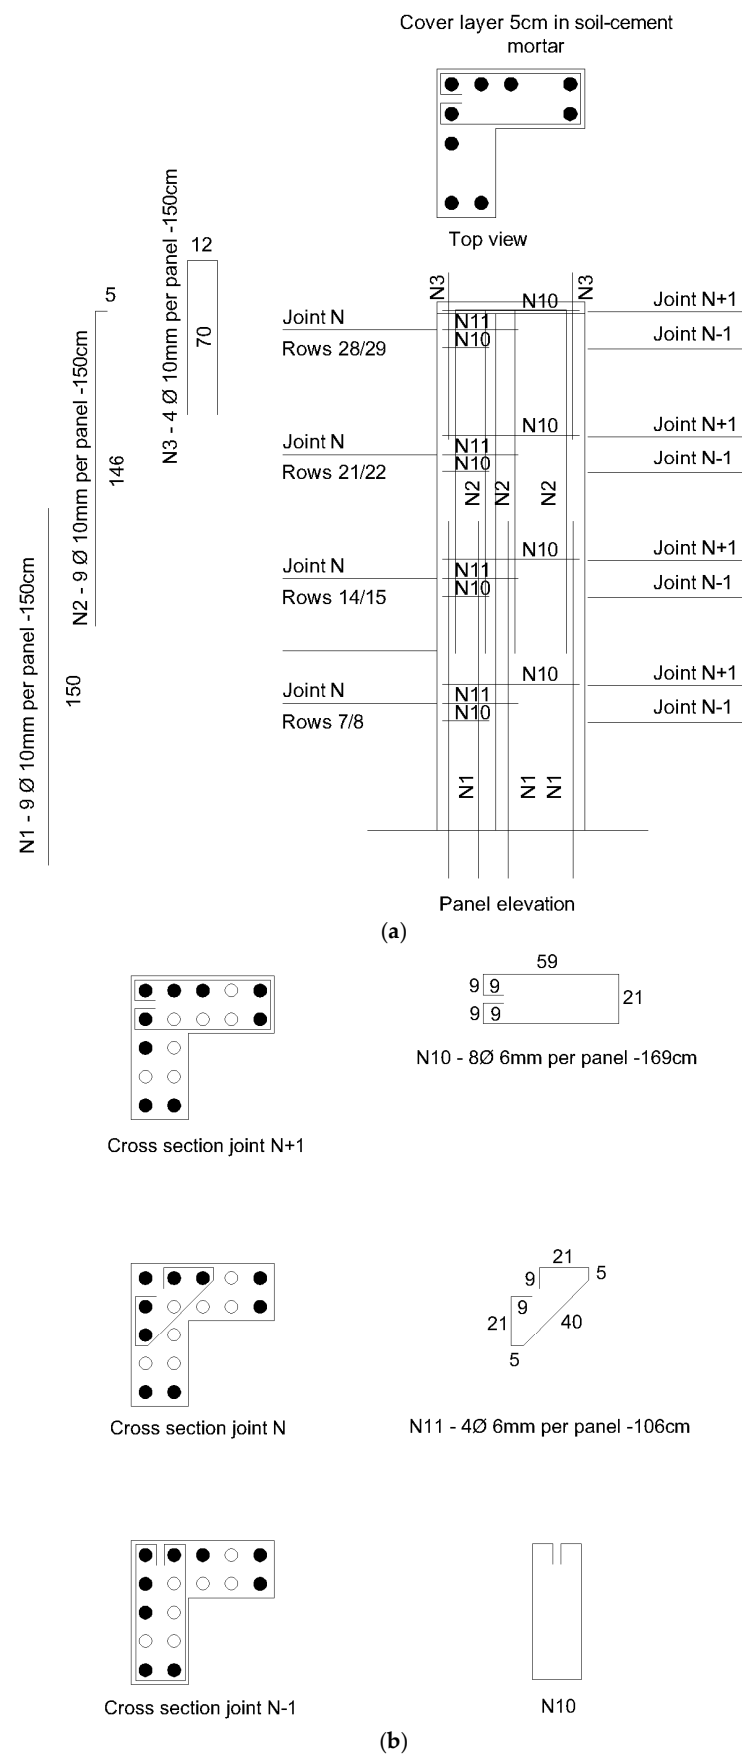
Executive design of C-panels: (a) vertical reinforcement; (b) horizontal reinforcement.
